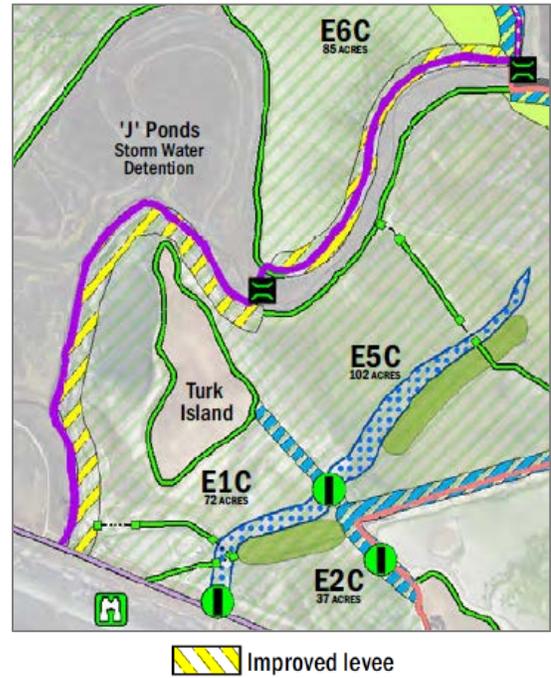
Plan of Bay Trail Levee (E6C – ACFCC) (Alt. B)
